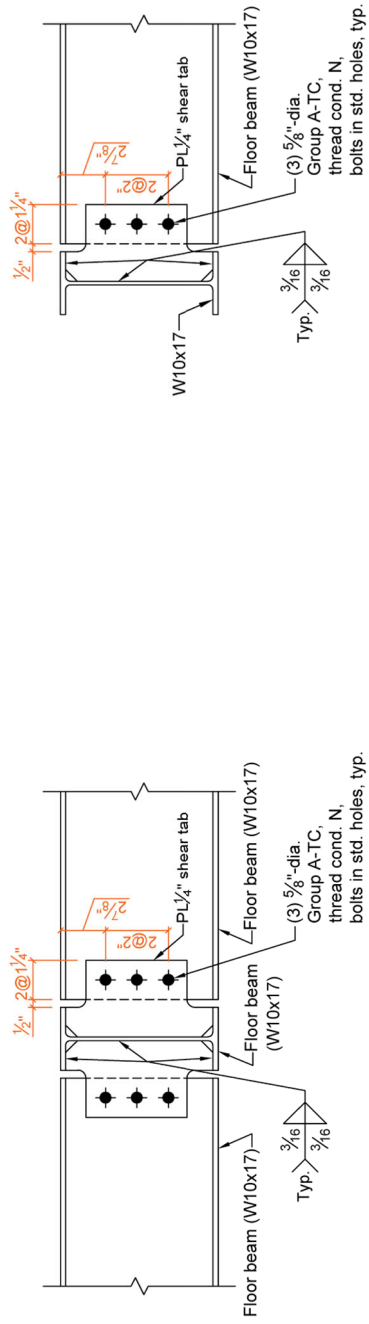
Phase 2 Test Building: Beam-to-Beam Connections
